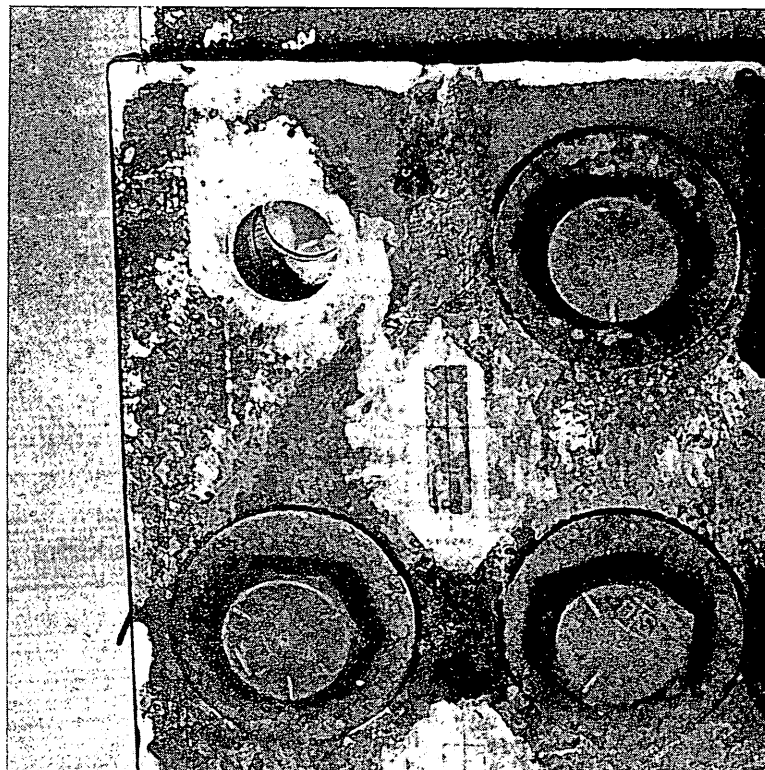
JOINT B6 FAILURE SHOWING SHEARED BOLT SHANK
